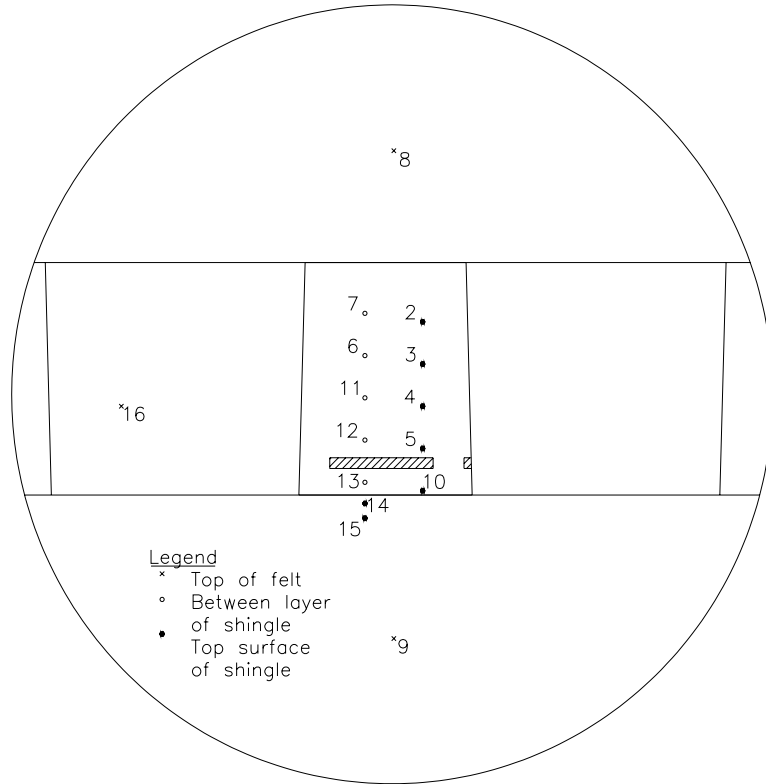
Sketch Showing Pressure Tap Layout on Architectural Shingle Specimen.
